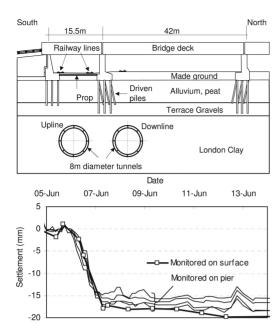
Tunnelling for CTRL beneath end-bearing piles at Renwick Road Bridge (Jacobsz et al. 2005).
